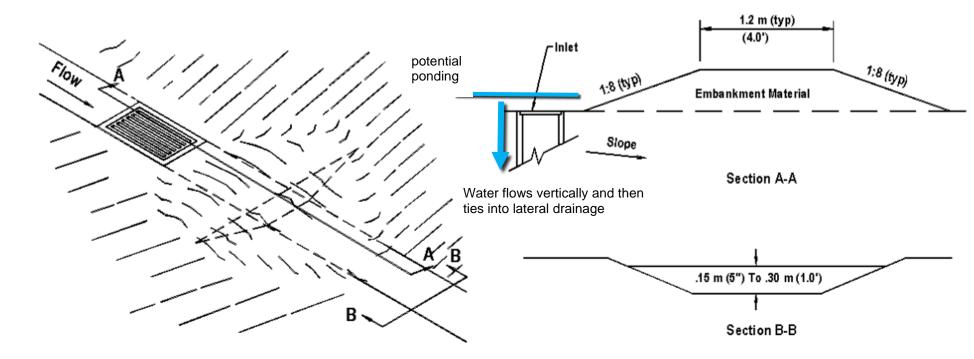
Plan and profile sections for a type of inlet drop structure with a downstream embankment to allow water to pool and drain into the inlet and then be relayed by vertical and lateral culverts (from Brown et al., 2009).
